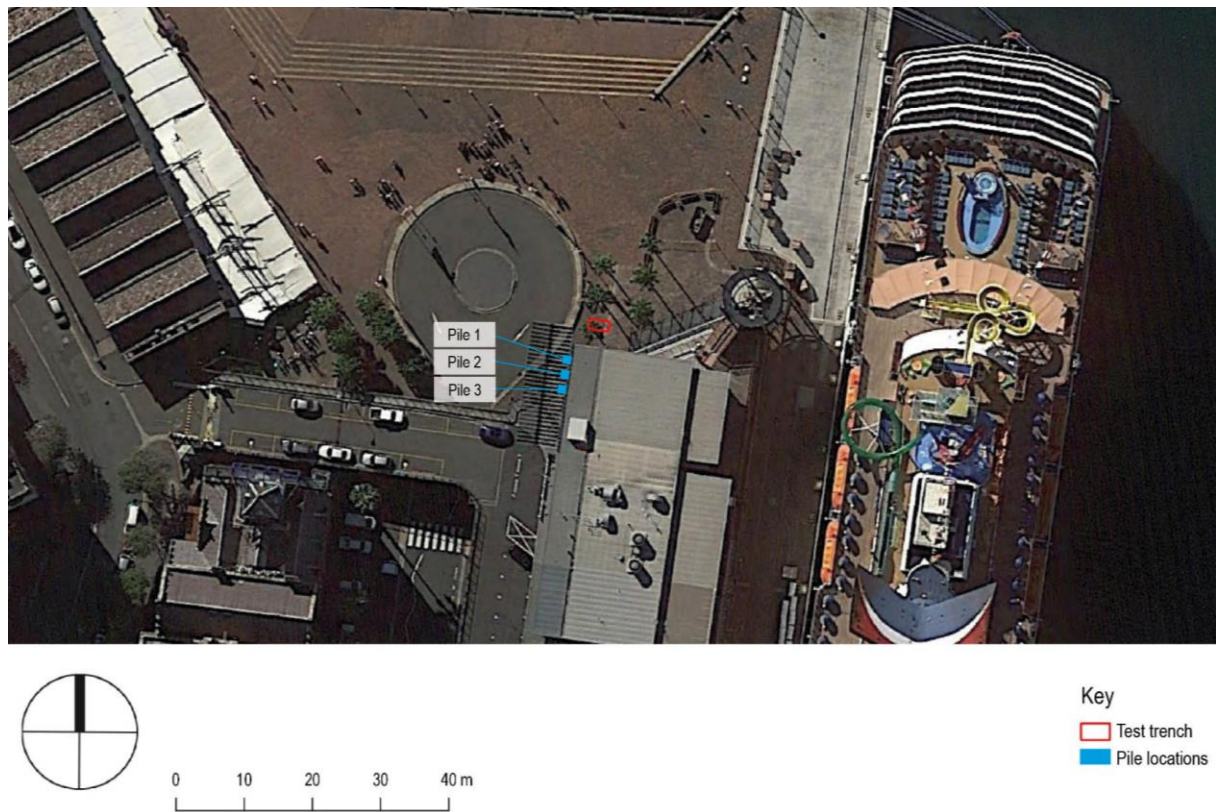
Surveyed location of the proposed micro-brewery footing test trench, and support column piles. (Source: GML)
